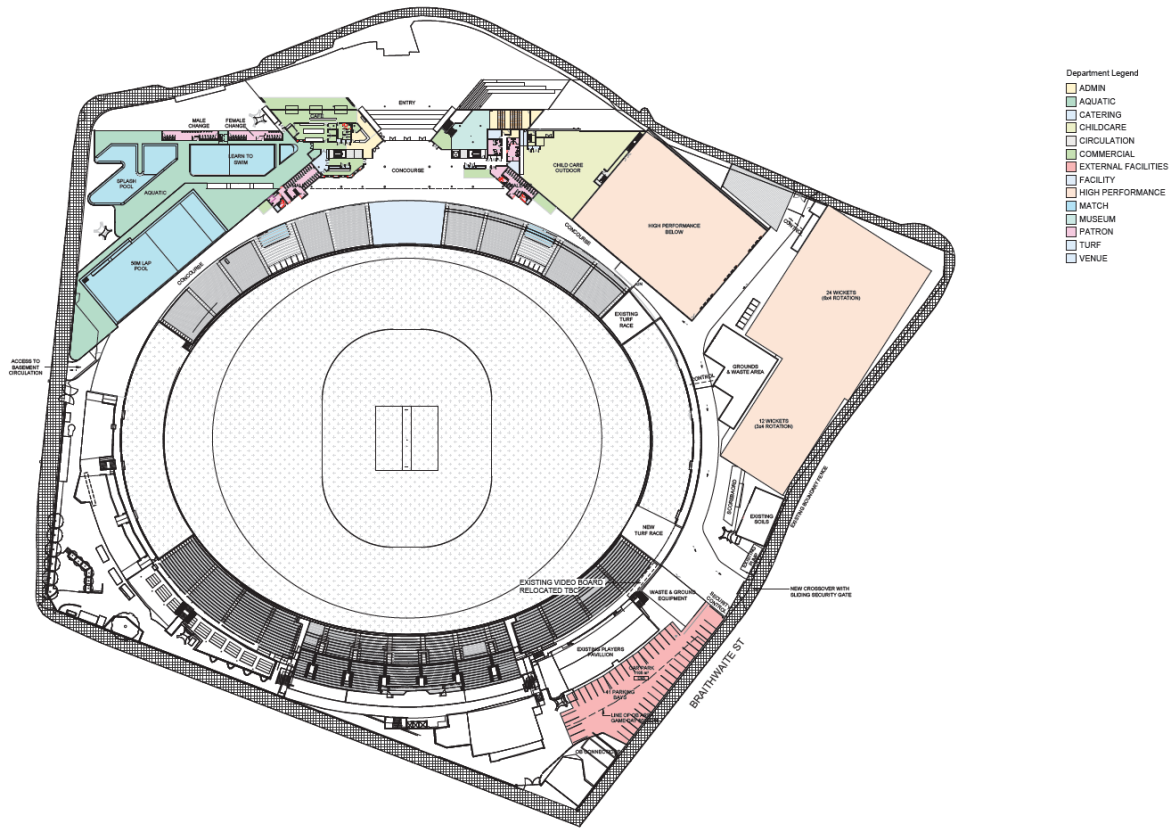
Overall redevelopment plan for WACA (source: WACA)
